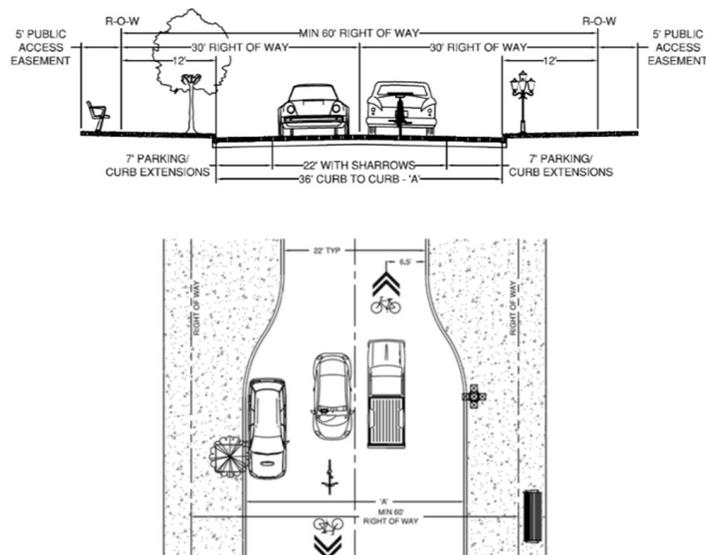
APPLIES TO SECOND STREET NORTH AND SOUTH OF GREENWOOD AVENUE,
